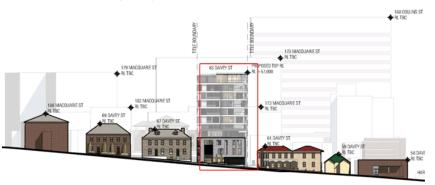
Context height study, enlarged to show illustrative street elevation with the proposal in context of neighbouring buildings with frontage to Davey Street (source: JAWS Architects)
